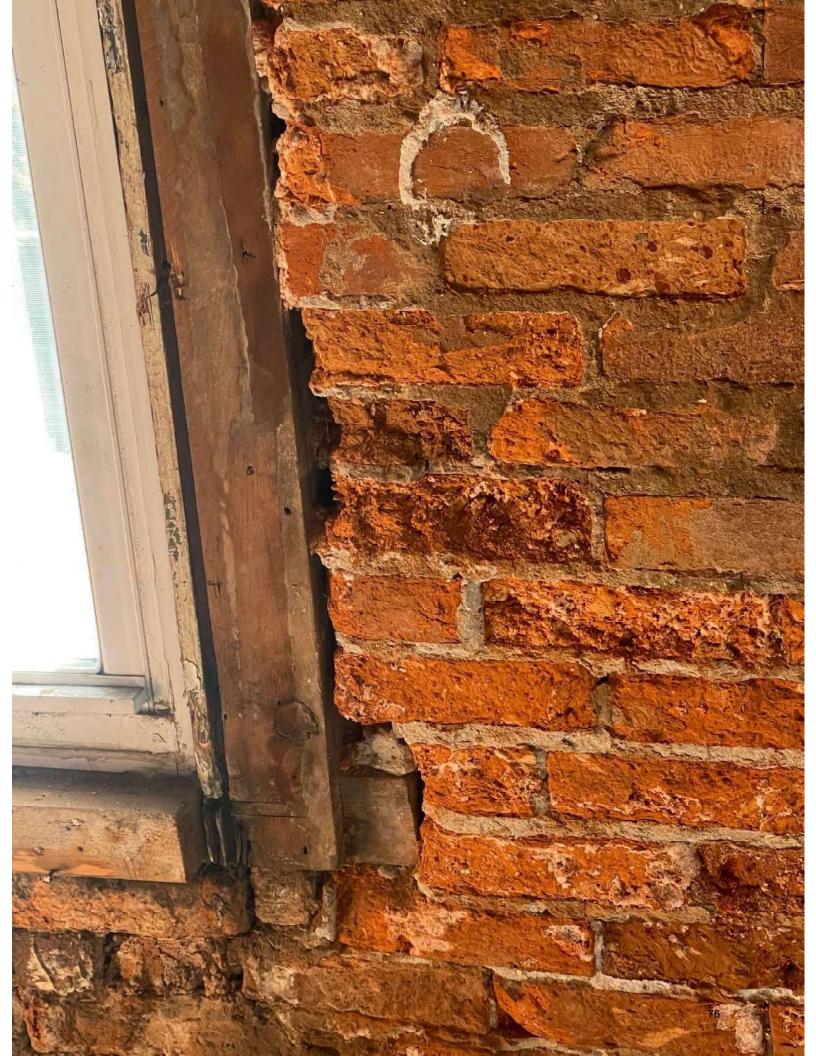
Significant gaps between second floor and third floor as well as the underlying brickwork.
